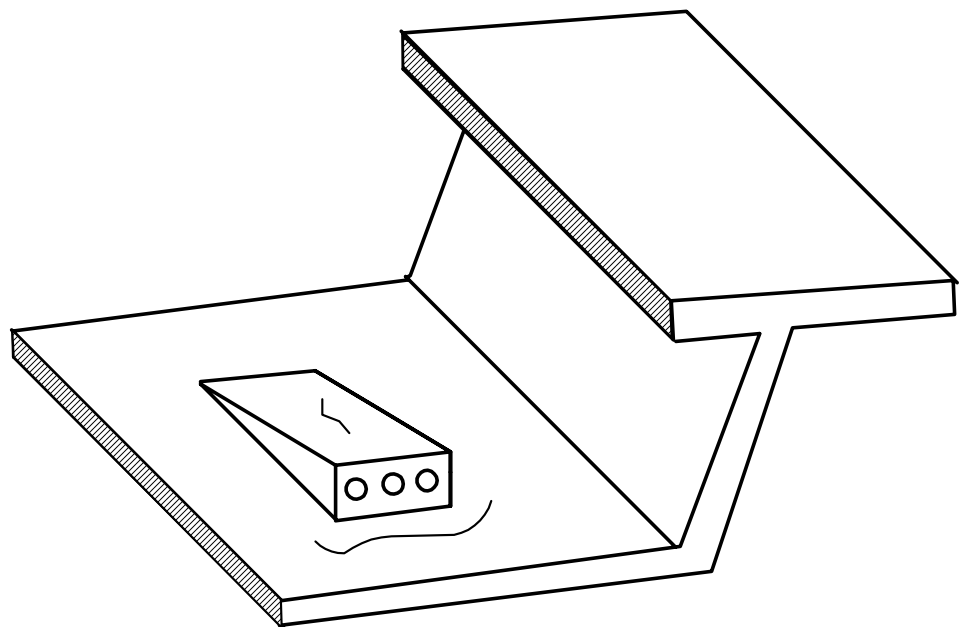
Box Girder Cracks Adjacent to Anchorage Block
